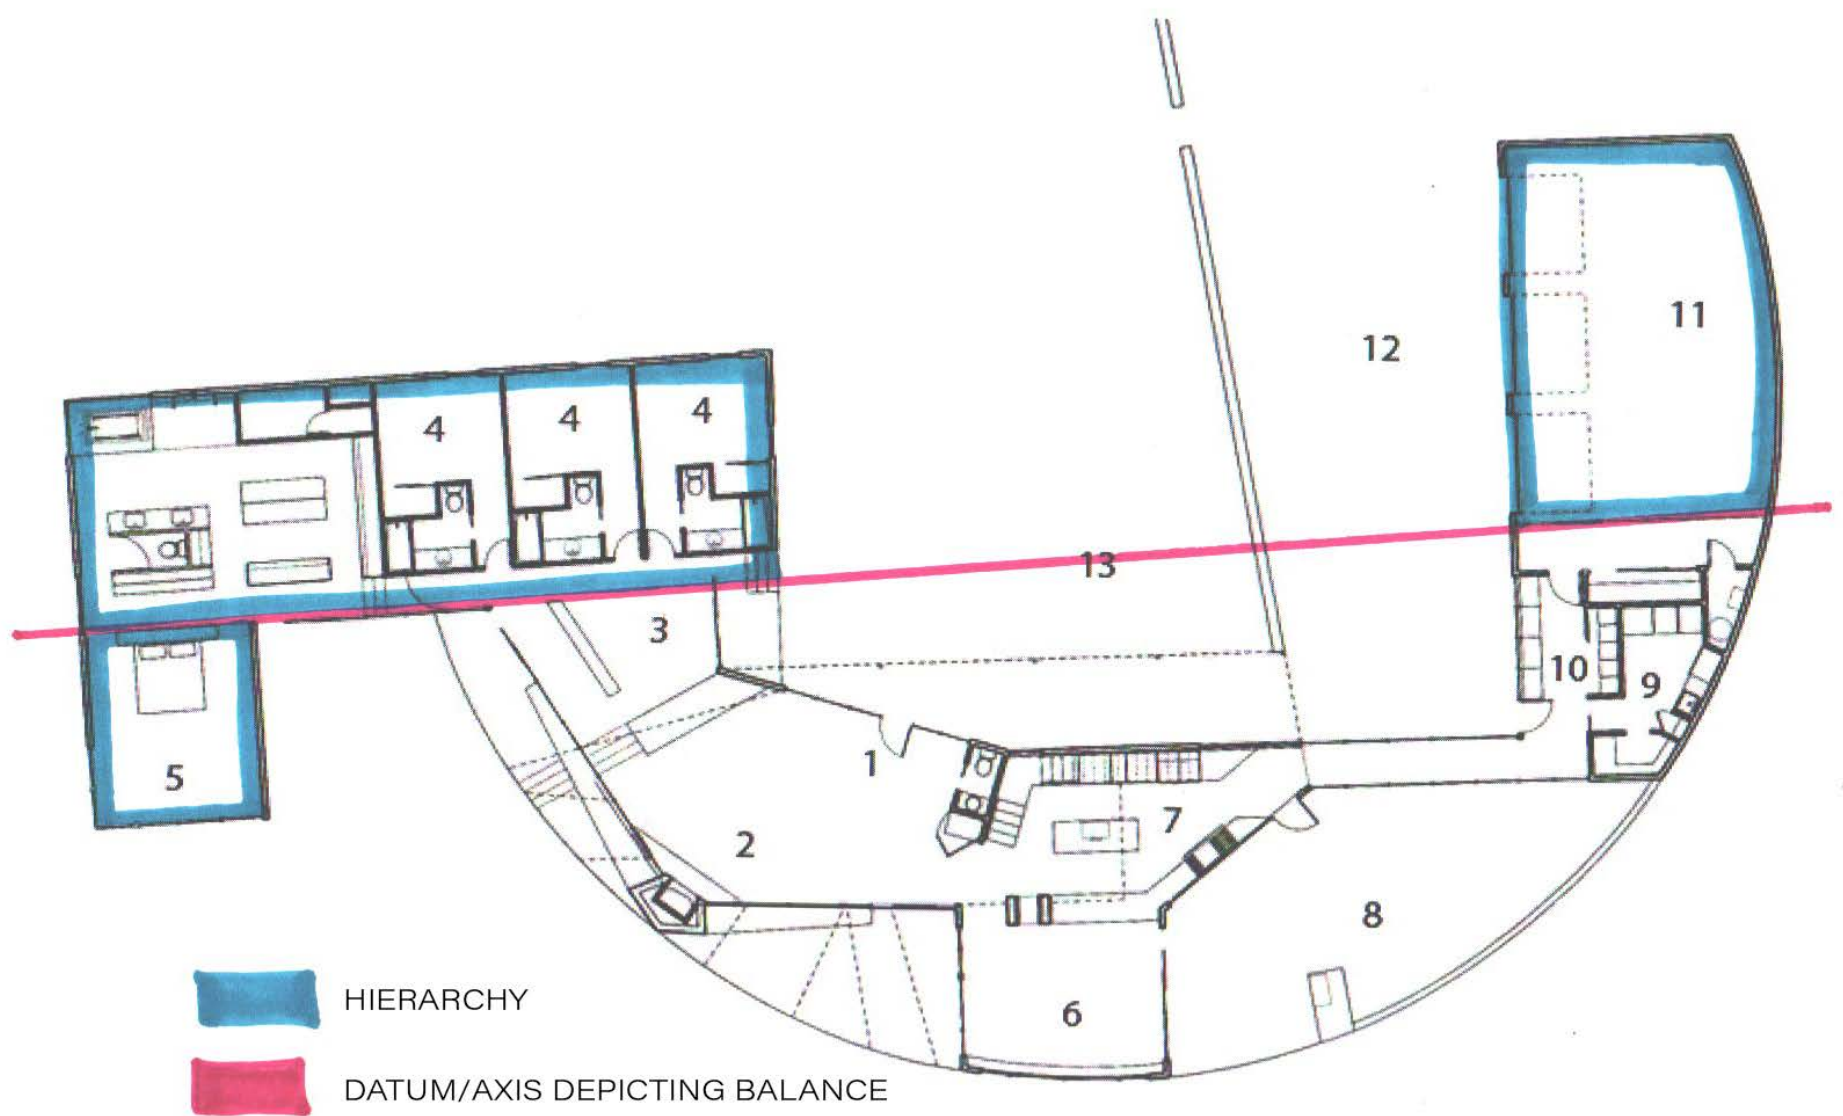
Sage House's floor plan. FROM: Architectural Digest, 2018.
